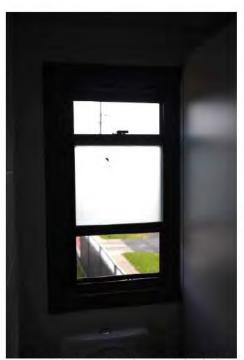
| Mezzanine Bathroom window looking N. Lewis Street at right.
